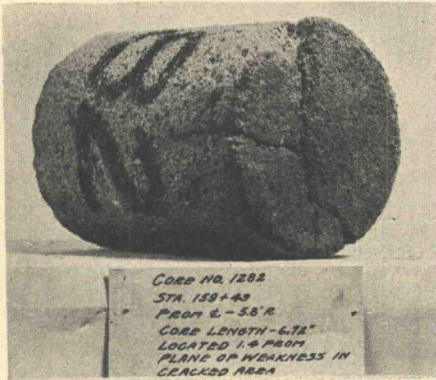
Core from Cracked Sand-Gravel Pavement
